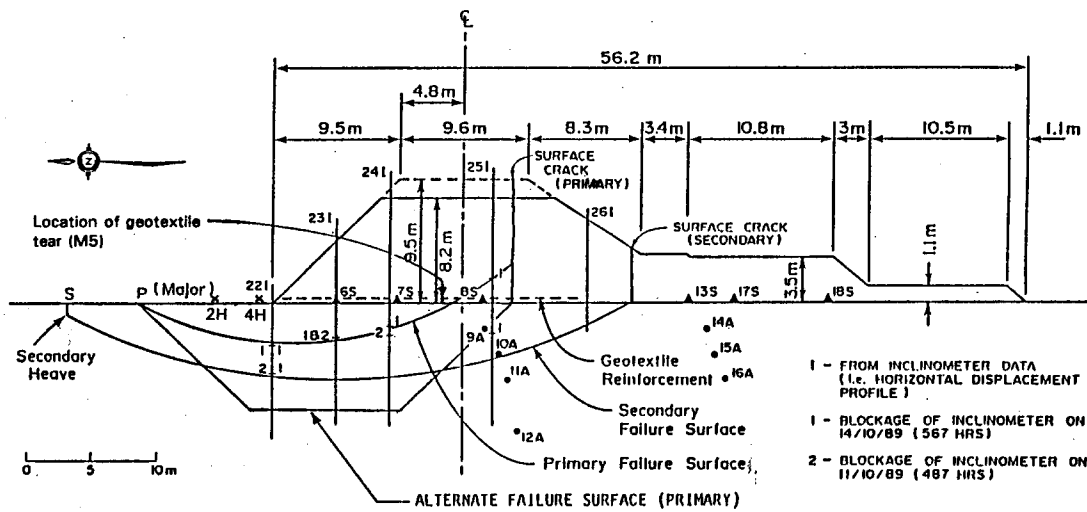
EMBANKMENT GEOMETRY AND INFERRED FAILURE SURFACES: REINFORCED SECTION
